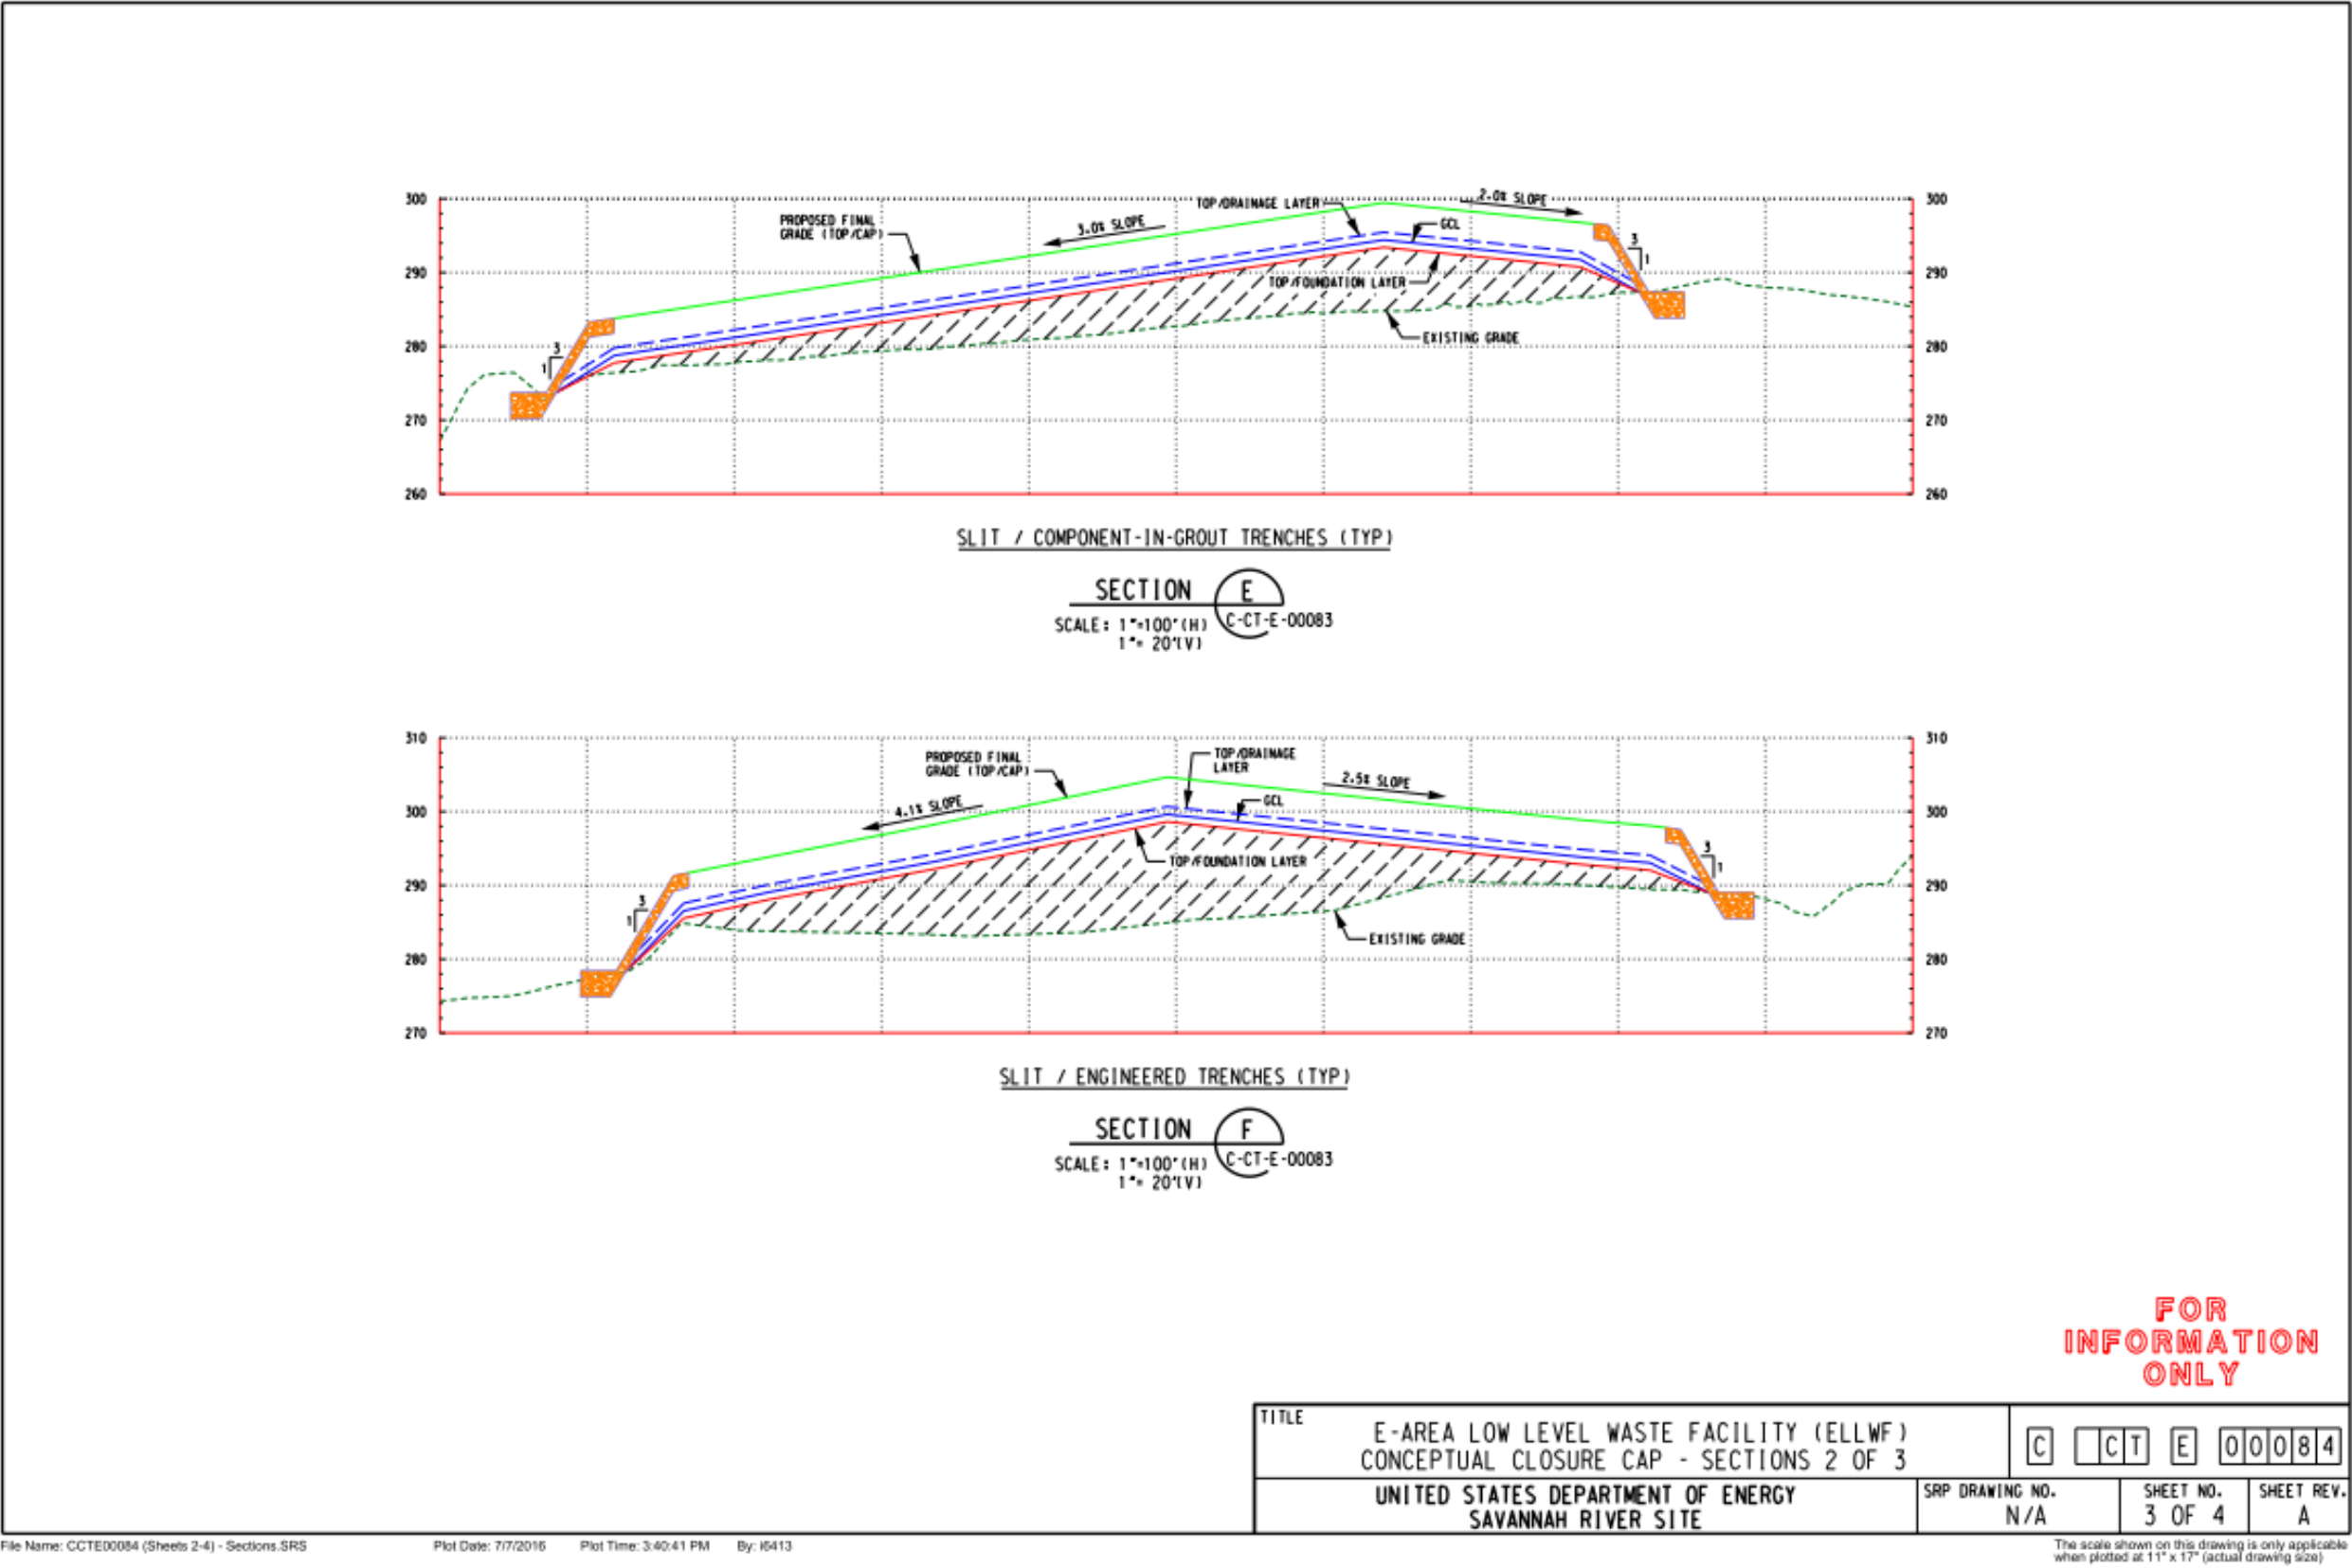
Conceptual Closure Cap Design Details (Sheet 3 of 4) – Cross-Sections for Slit Trench, Components-in-Grout Trench Segment, and Engineered Trench (C-CT-E-00084, 2016)
